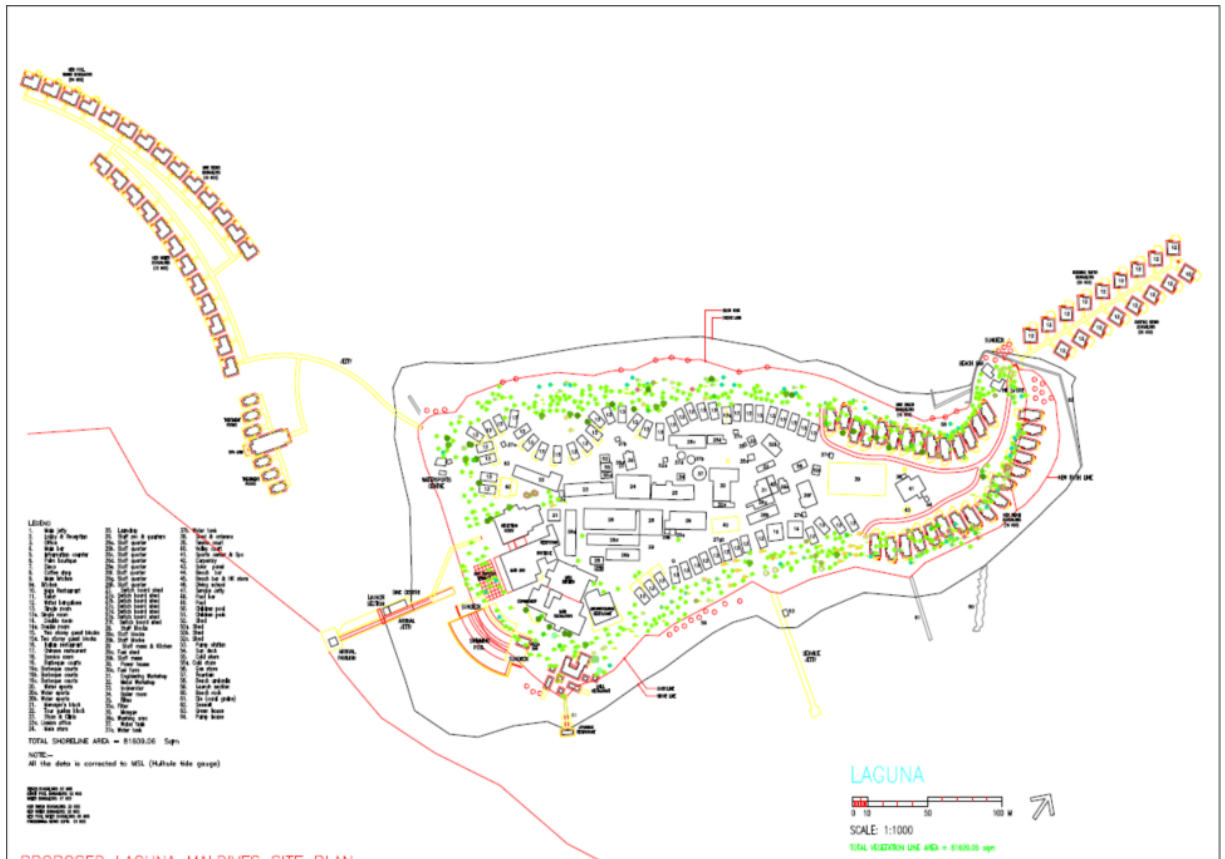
Proposed redevelopment plan showing the location of new over water Villas
